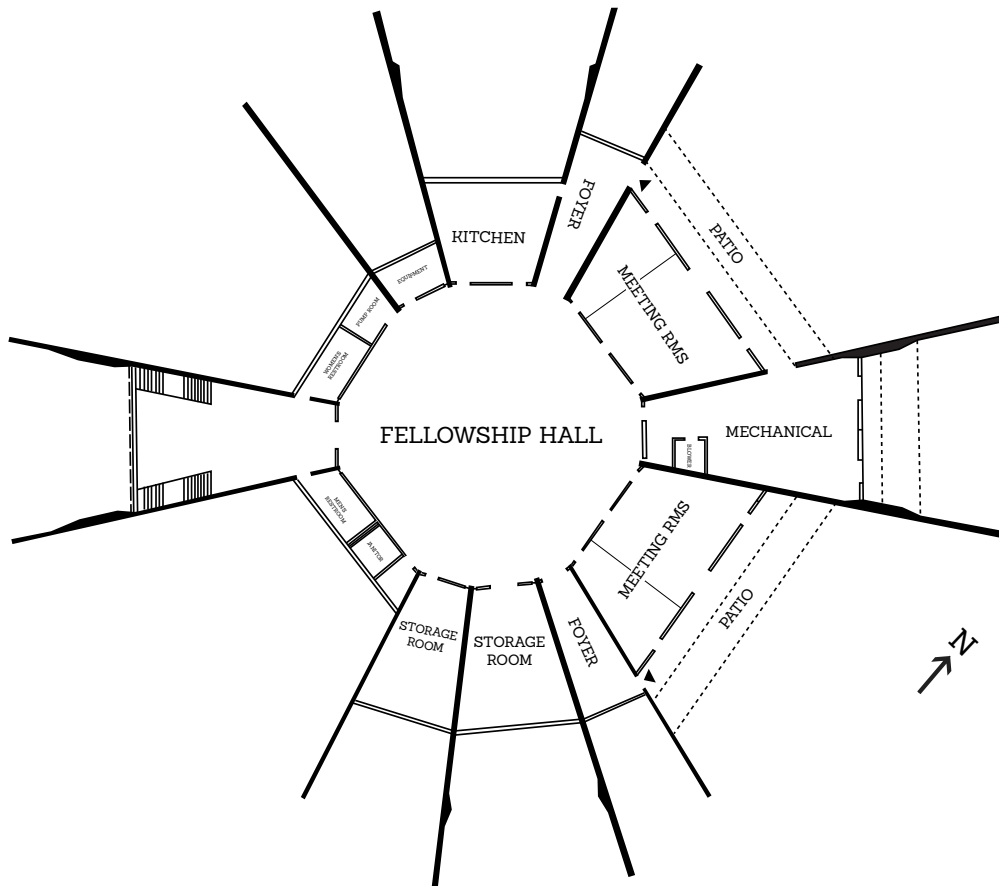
of 13. Basement-level plan with concrete radial walls shown in bold lines. Sketch by Building Conservation Associates, Inc.
